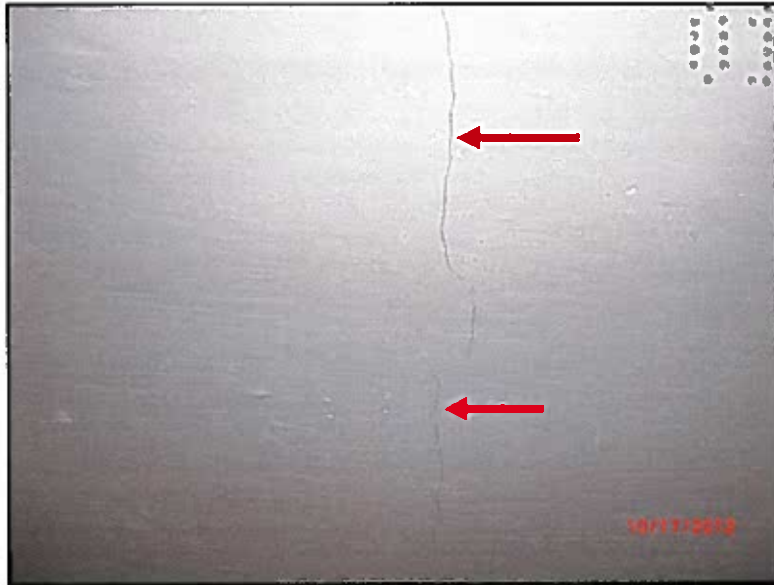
slab cracking at column drop panel next to Parking Space No. 267
